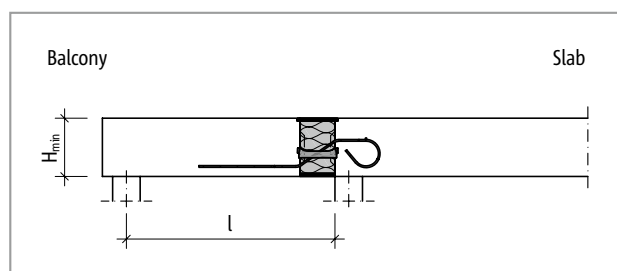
Schöck Isokorb® XT type Q: Static system (XT type Q-V1 to V4)
